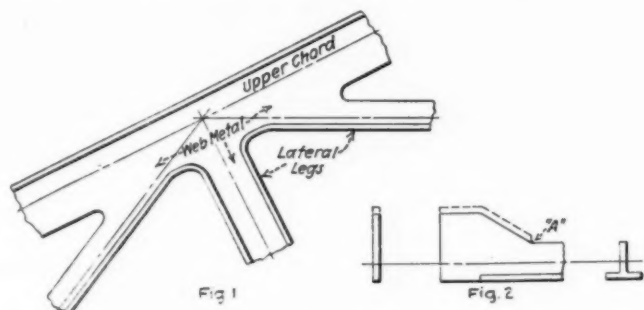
Shows an Ideal Joint for Structural Shapes—Fig. 2 is a Study of a Joint Between a Shape and a Gusset Plate
